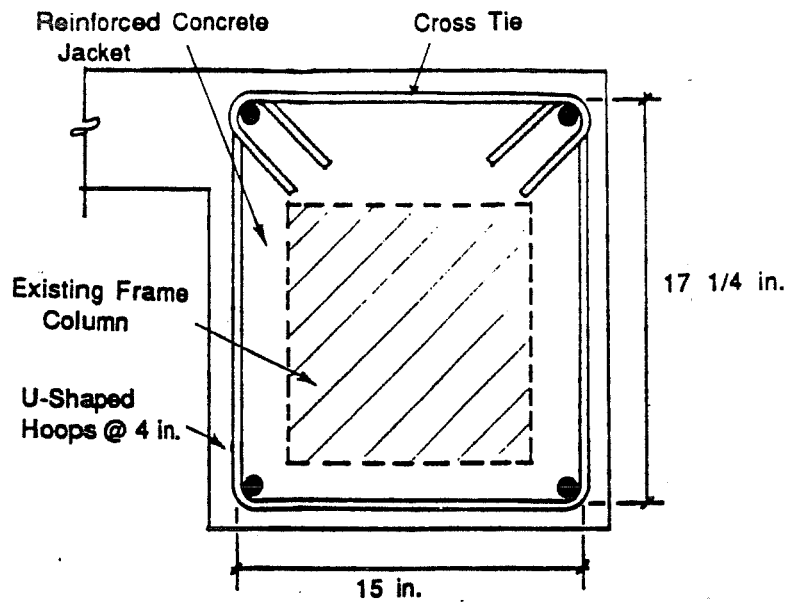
Section view of Jimenez's column jacketing scheme [3].
